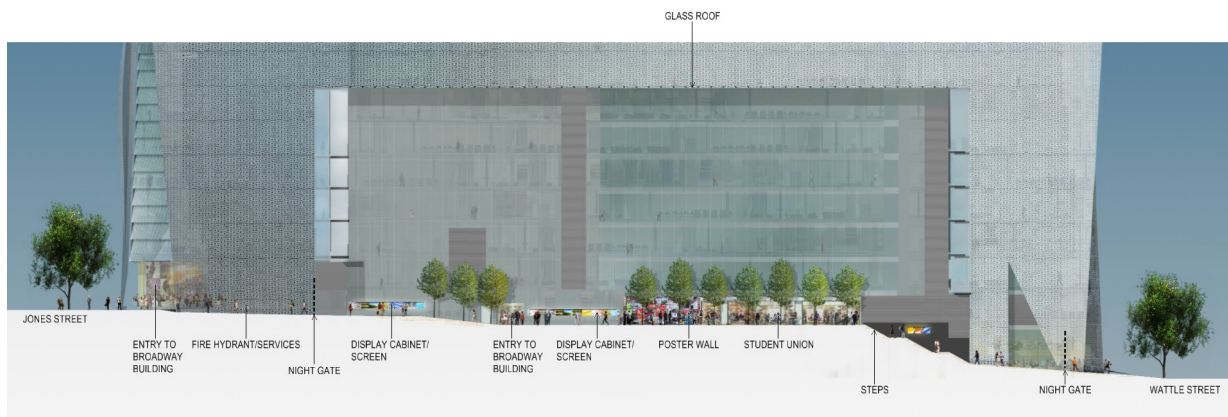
Landscaping to Arcade looking south (Source: DCM)
